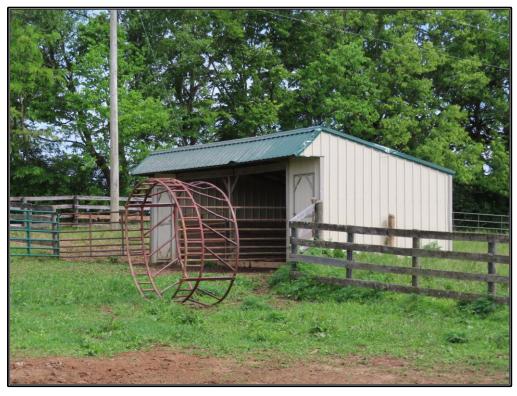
Site 3 (SC 173): North and west elevations of the livestock shelter (Resource I), looking southeast.
